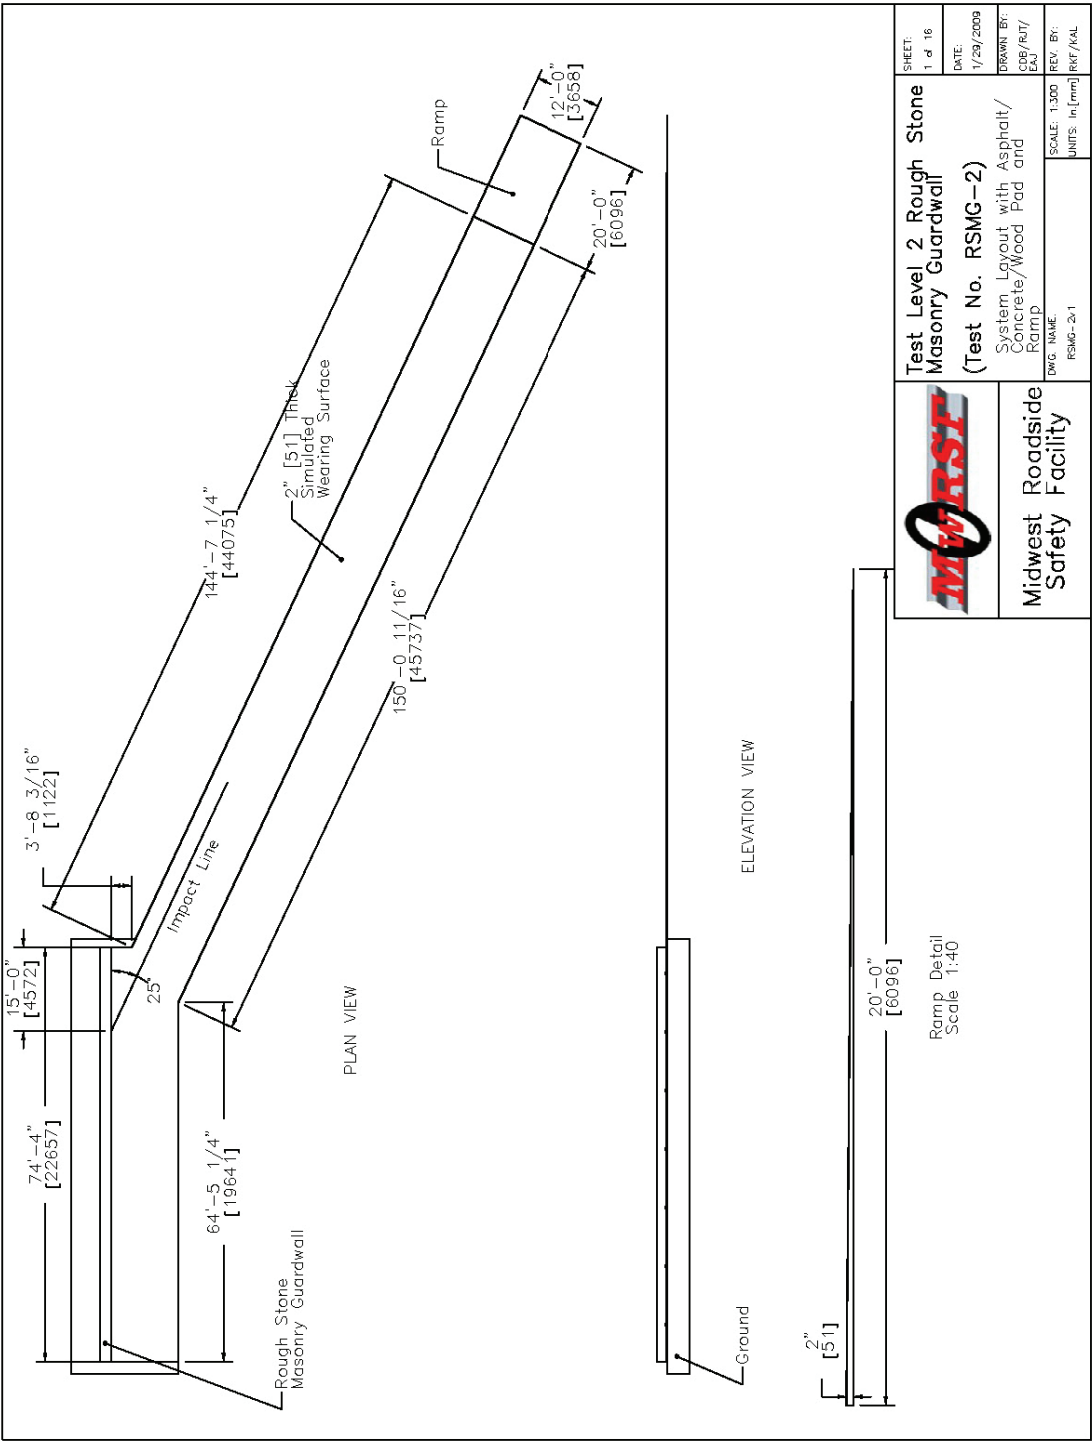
System Layout with Wearing Surface Pad and Ramp, Test No. RSMG-2
